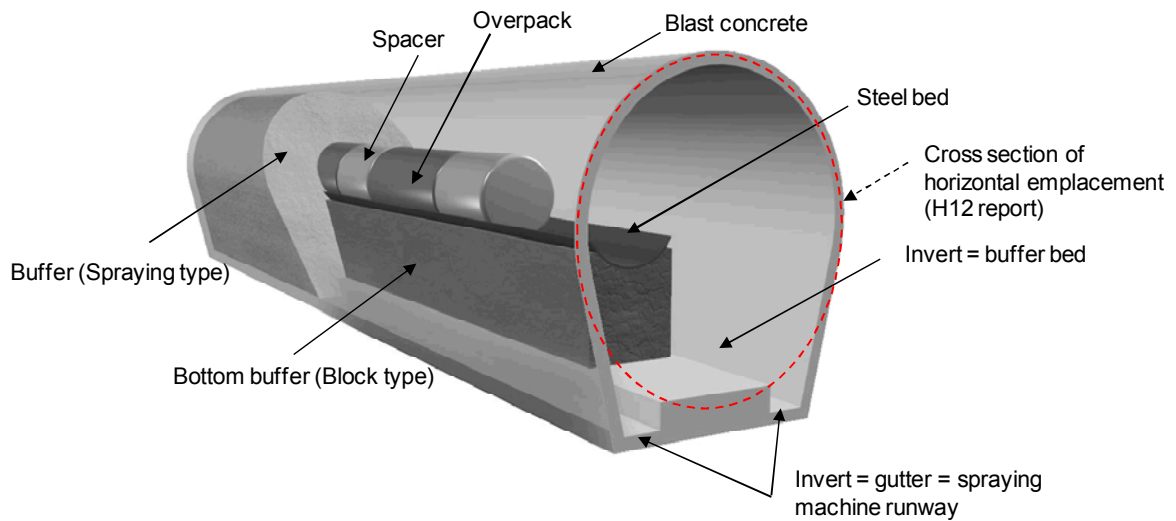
Emplacement option considering assumed underground conditions (horizontal emplacement/in-situ construction)
